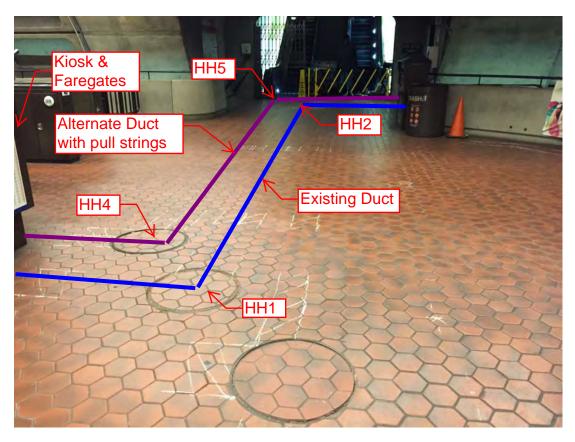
Mezzanine layout showing existing / alternate duct runs.
